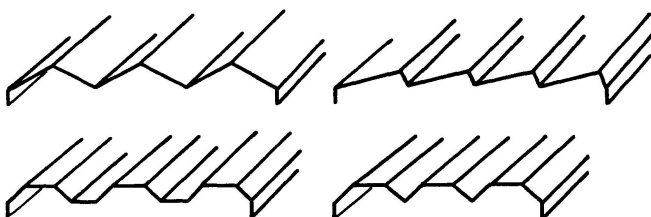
Some Alternative Cross-sections for Folded Plate Structures.
